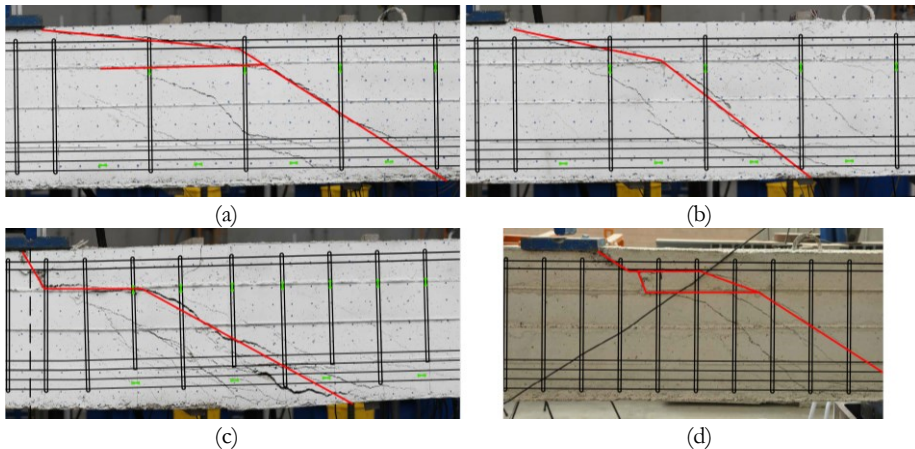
Internal reinforcement on photos of the failure: (a) beam S1; (b) beam S2; (c) beam S3; (d) beam S4.
